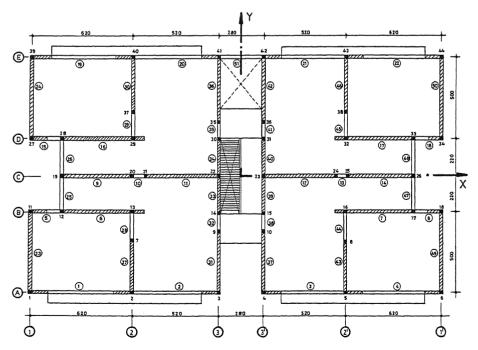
TYPICAL FLOOR AND ELEMENT IDENTIFICATION FOR THE DUBLE ALMEYDA BUILDING
